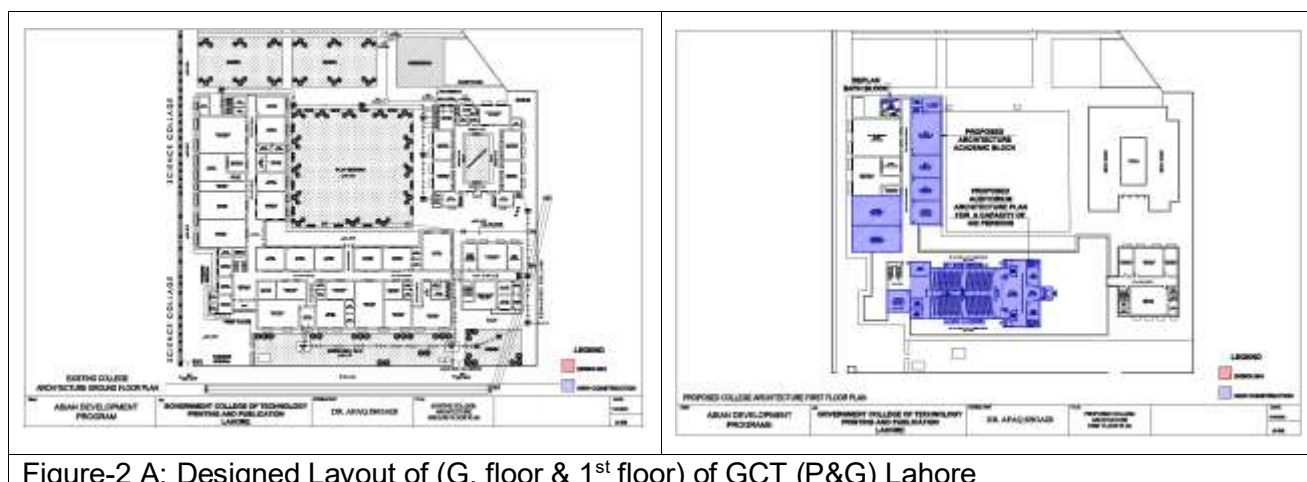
A: Designed Layout of (G. floor & 1st floor) of GCT (P&G) Lahore
